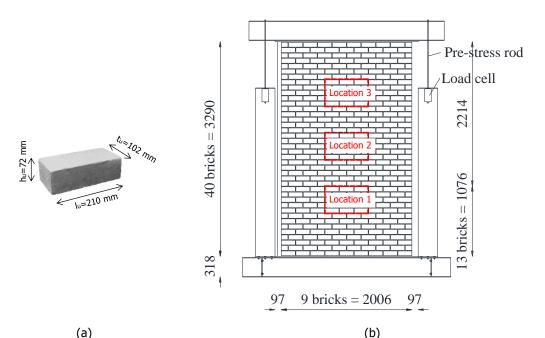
Geometry of calcium silicate wall adopted for in-situ test technique and testing locations.
